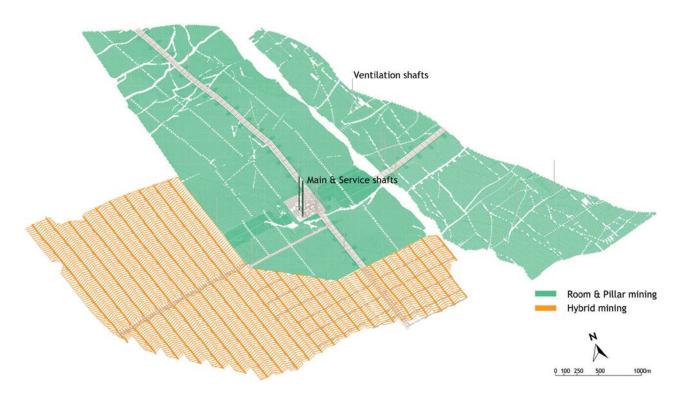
Three-dimensional view, Styldrift I shaft mine design
